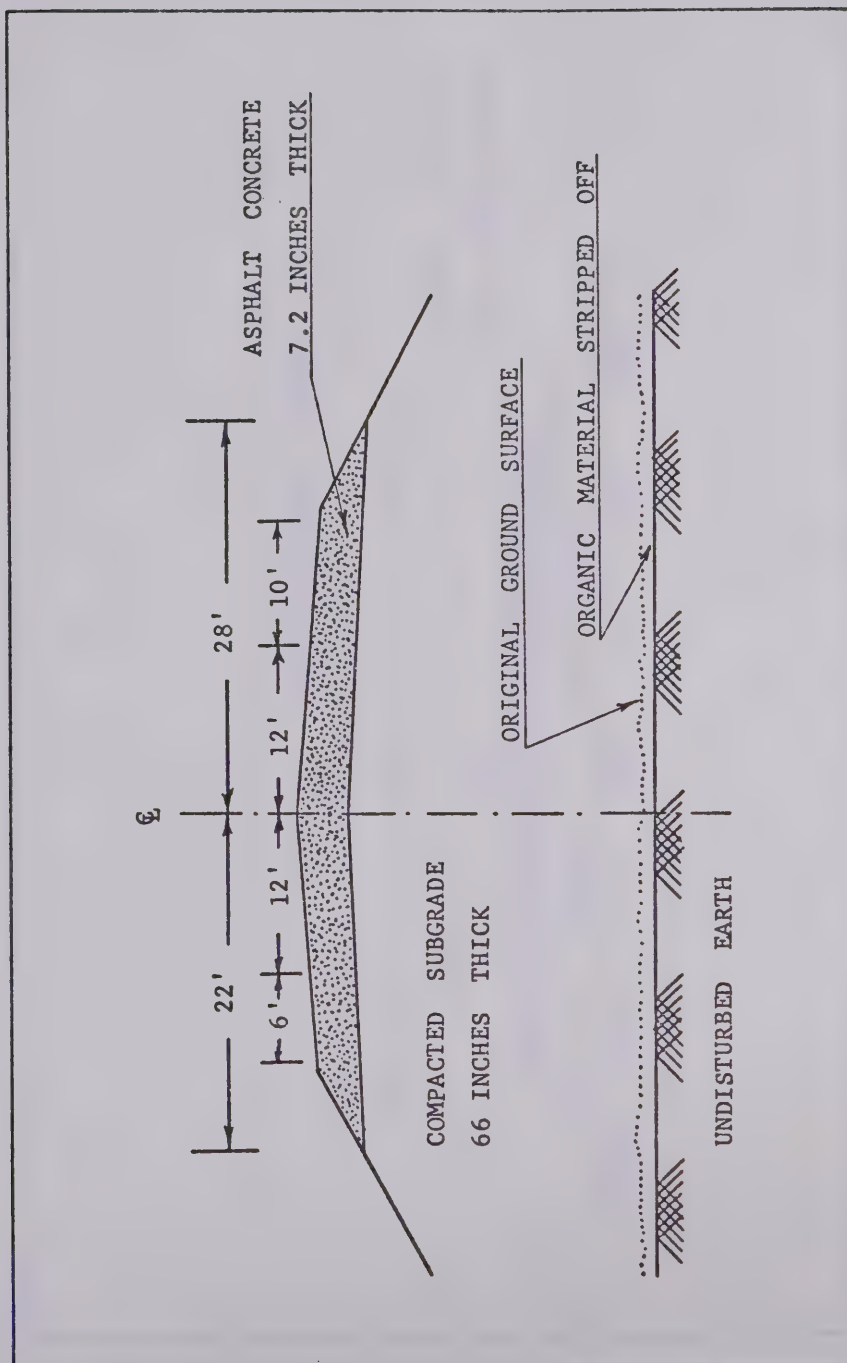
CROSS-SECTION OF HIGHWAY 15-A-1, AT MILE 9.44
